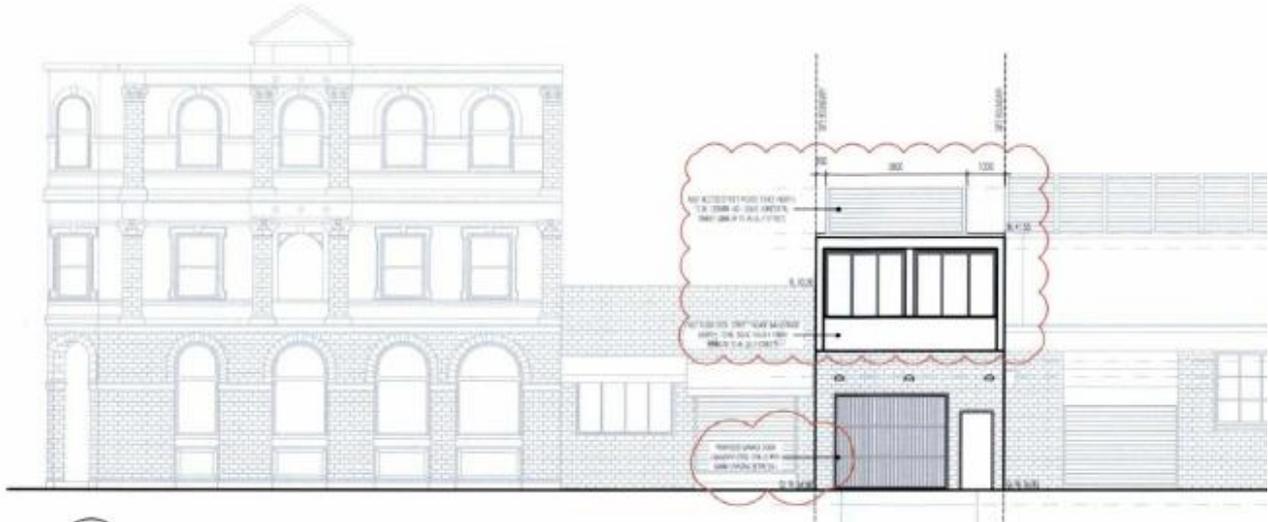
The approved northern elevation of 33 Spensley Street (PLN18/0101).
